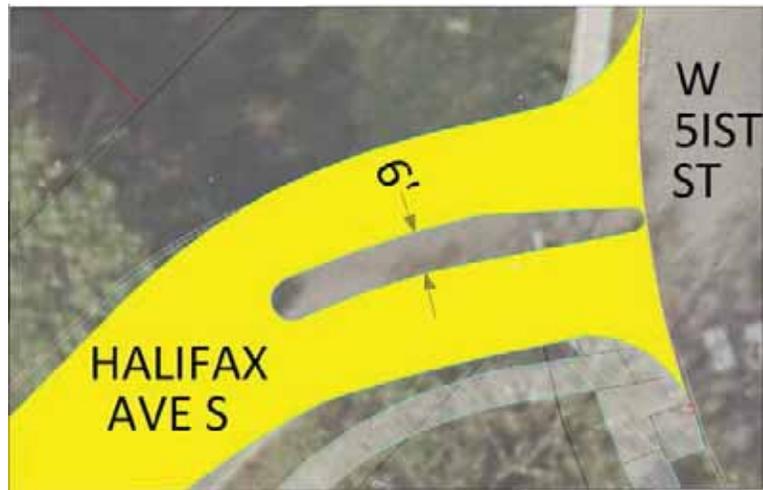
Halifax Avenue South and West 51<sup>st</sup> Street
